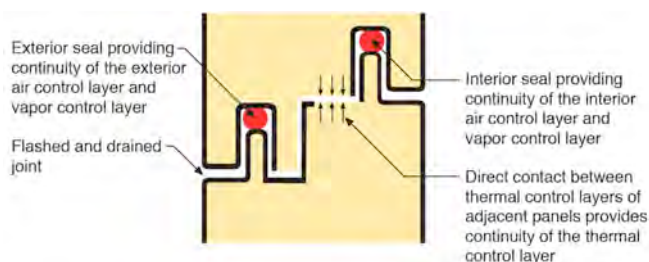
Wall Panel Joint—Water control layer continuity is provided by a “flushed” and drained joint. The upward “tongue” of the lower panel functions similarly to the elevated vertical leg of a “metal flashing”. The exterior horizontal gap between upper and lower panels facilitates drainage at the panel joint. Air and vapor control continuity is provided by sealant joints. Note that insulated panel systems have both interior and exterior air control and vapor control layers. As such they require both an interior and exterior seal. Thermal control continuity is provided by direct contract of the adjacent panel thermal control layers.
